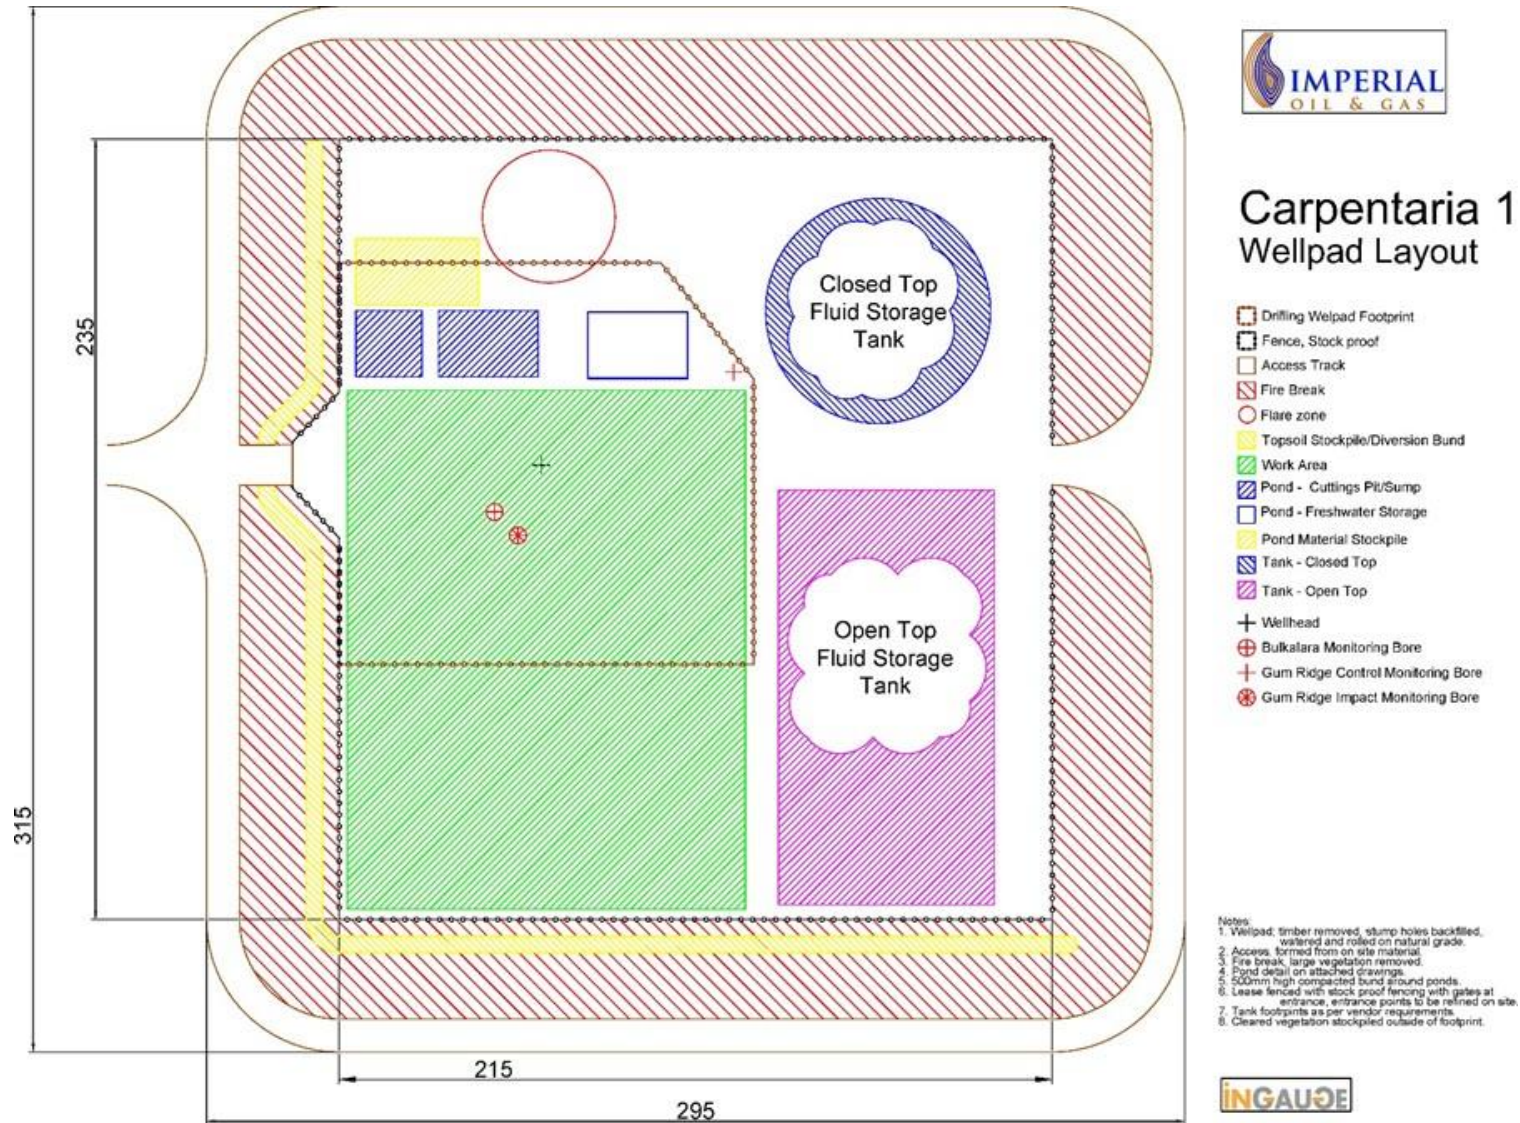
Carpentaria 1 Wellpad footprint with indicative tanks layout
